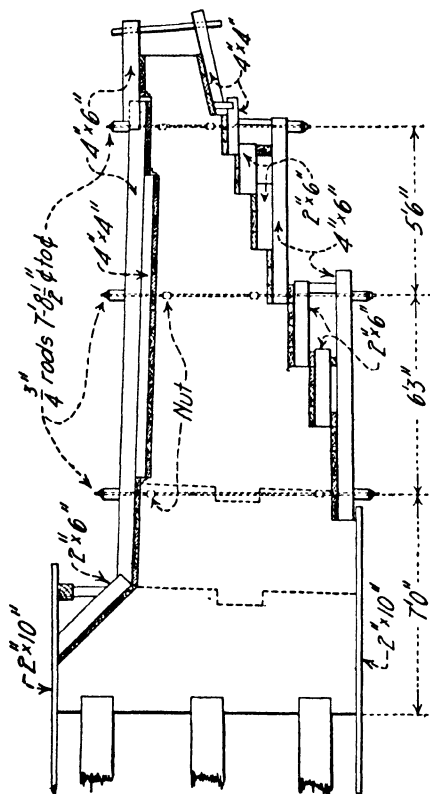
FORMS FOR ILLINOIS CENTRAL R. R. RETAINING WALL.
